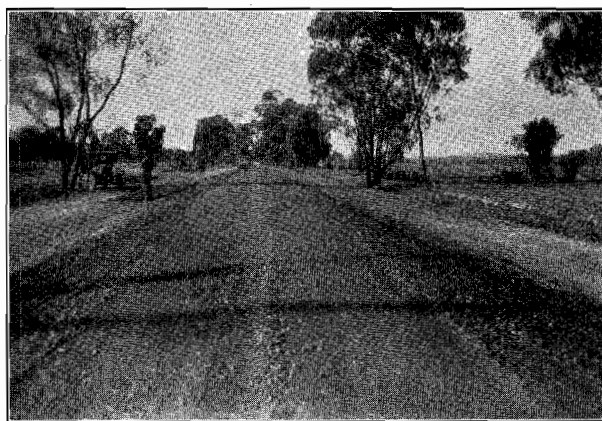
"Mixed-in-Place" Section under Traffic.
